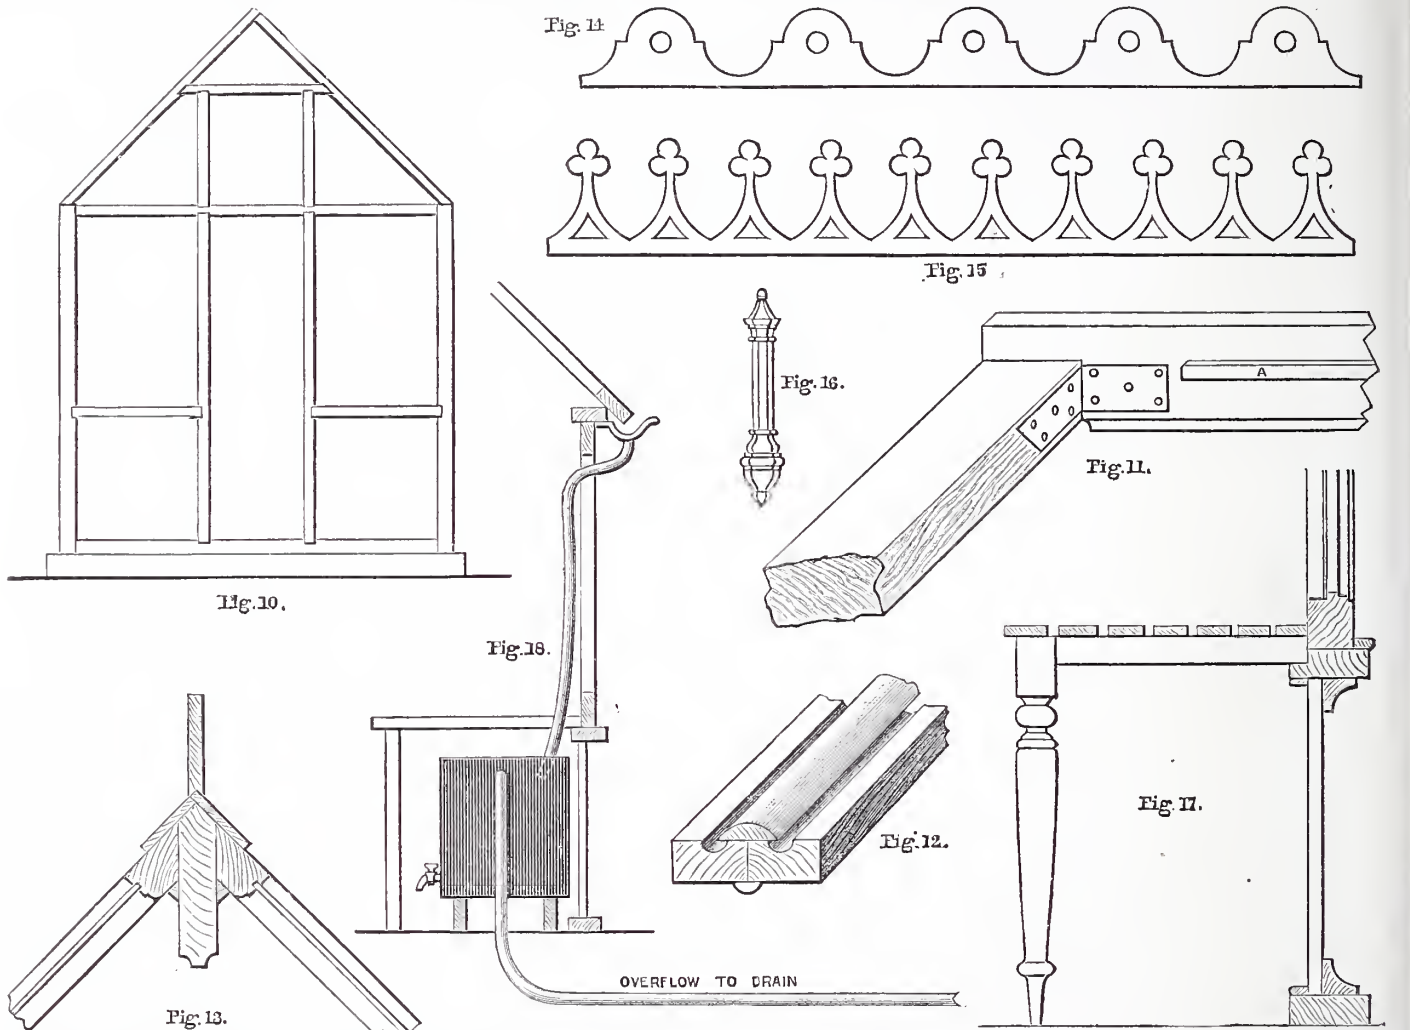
Elevation of Framing of Front End. Fig. 11.—Mode of Putting on Ridge Board. Fig. 12.—Details of Joint of Roof Sashes. Fig. 13.—Details of Ridge in Section. Fig. 14.—Cut-out Ridge Board. Fig. 15.—Alternative ditto. Fig. 16.—Octagonal Finial for End of Ridge. Fig. 17.—Details of Inside Shelves. Fig. 18.—Section showing Cistern for Rain-water with Mode of Collecting and Disposing of Overflow.
